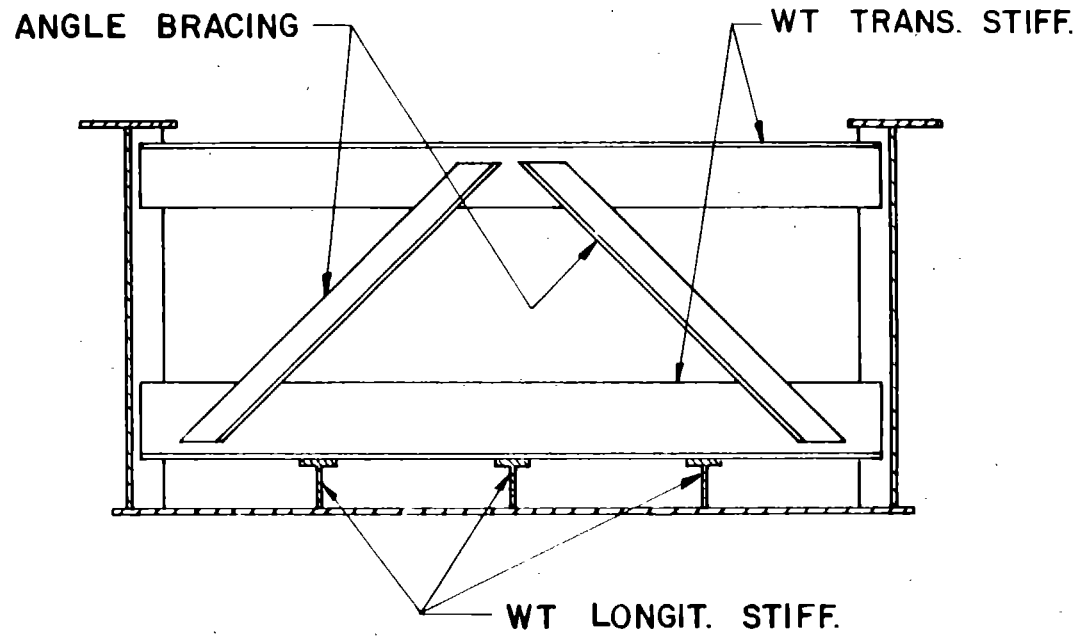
TYPICAL CROSS SECTION - PROPOSED SPECIFICATION
